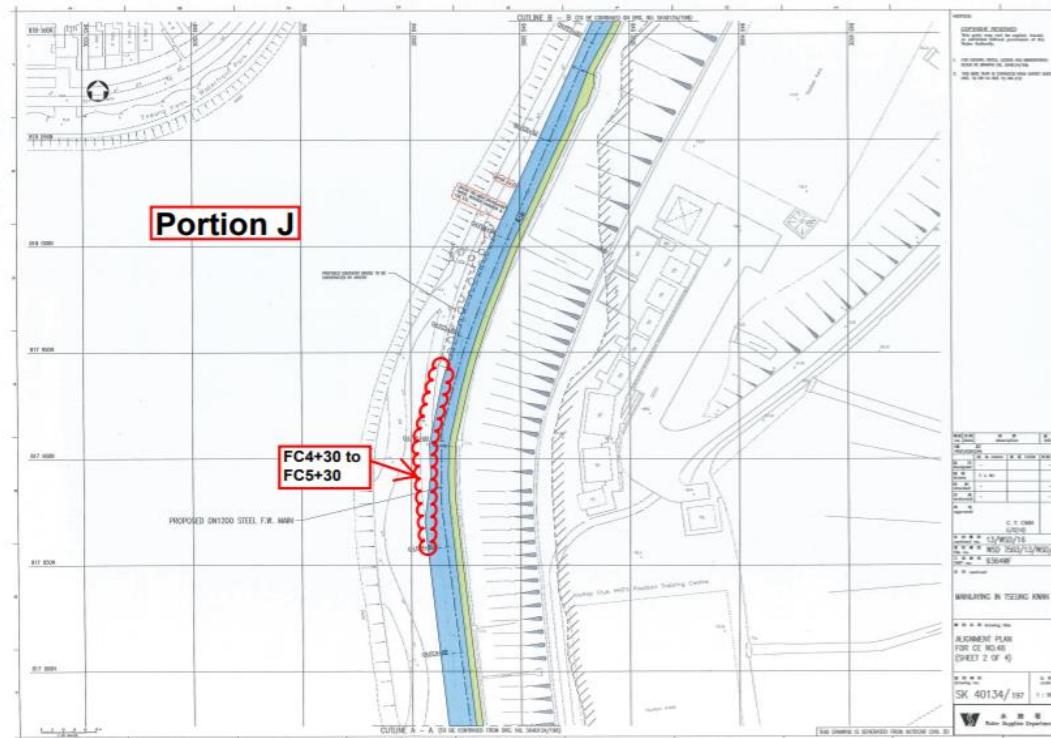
Location Plan for Portion J – Landfill Stage 1 (FC4+30-FC5+30)
